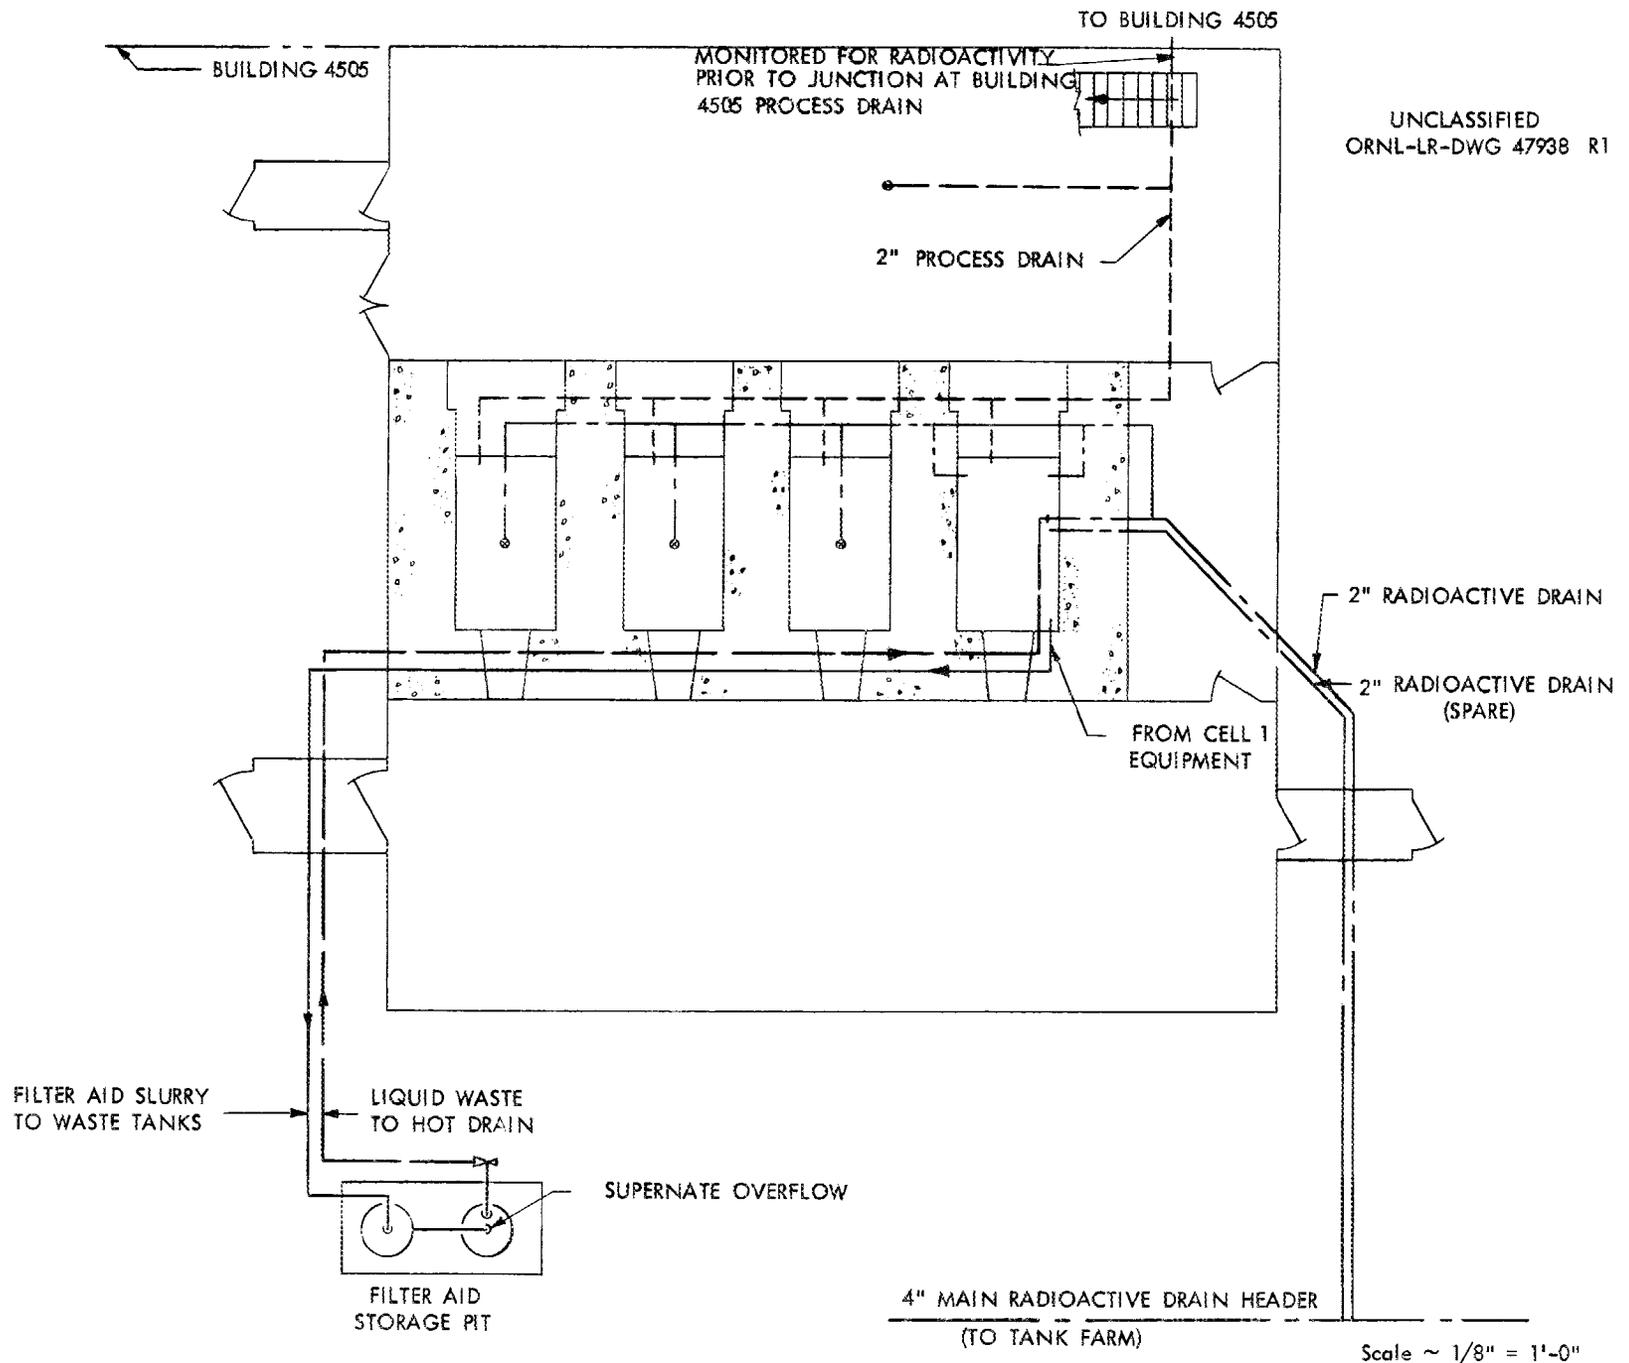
BUILDING 4507 FIRST FLOOR PLAN DRAIN SYSTEMS SCHEMATIC
